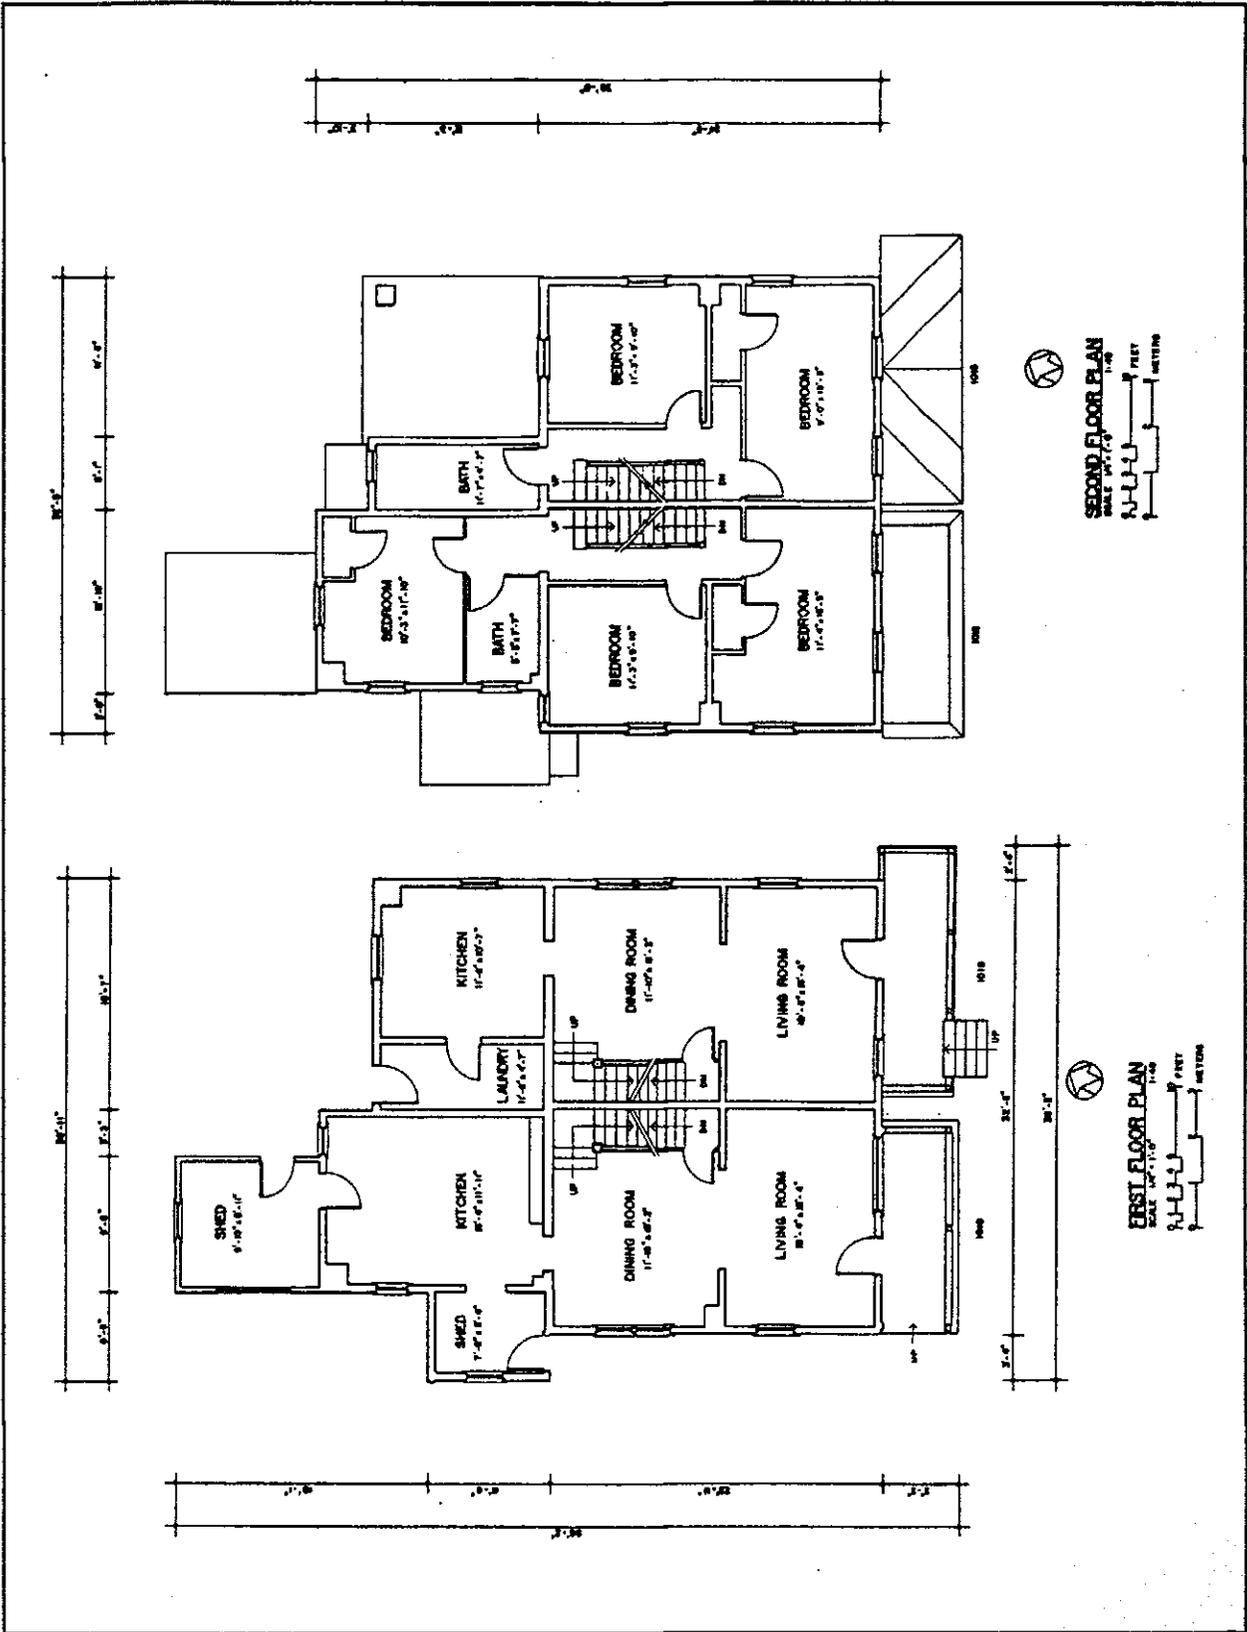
First- and second-floor plans. Drawn by Elaine Pierce, June 1989.
